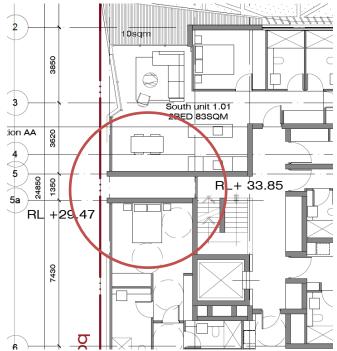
Window opening to common core area of the southern building block (shown at Levels 01 to 06)
